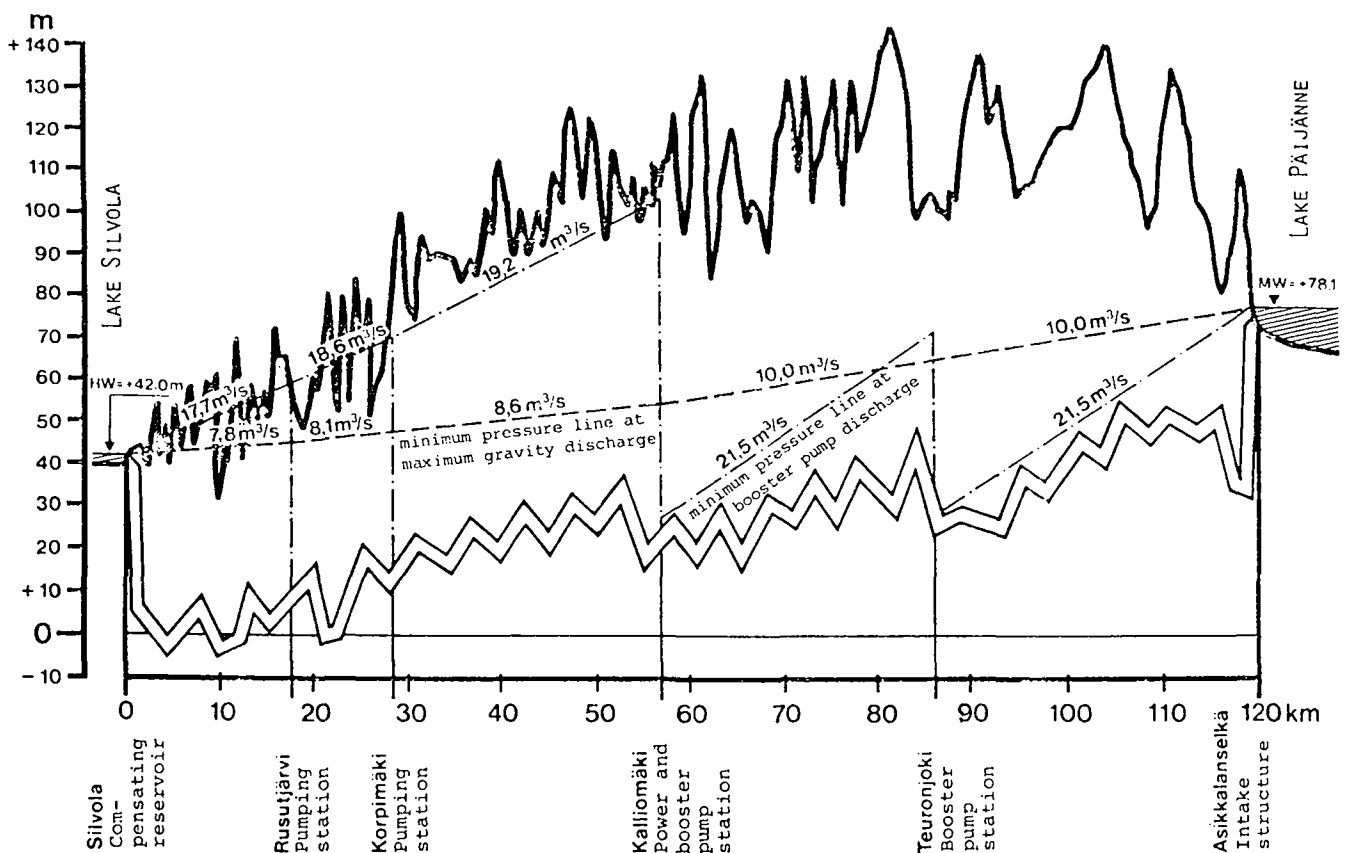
Longitudinal section of the Päijänne pressure tunnel
